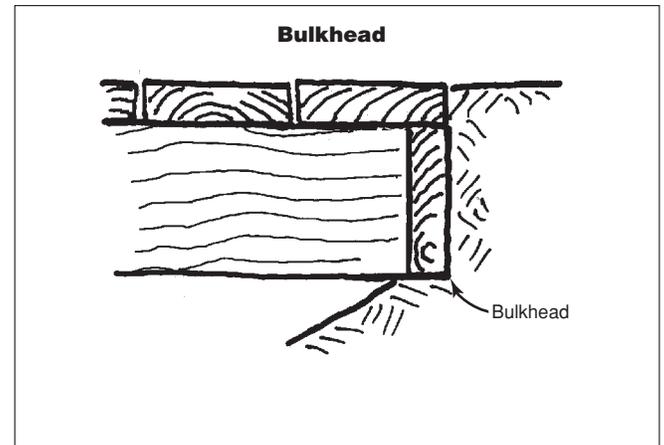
Bulkheads serve as retaining walls to support the earth, and they protect the stringers from decay and insect damage.
